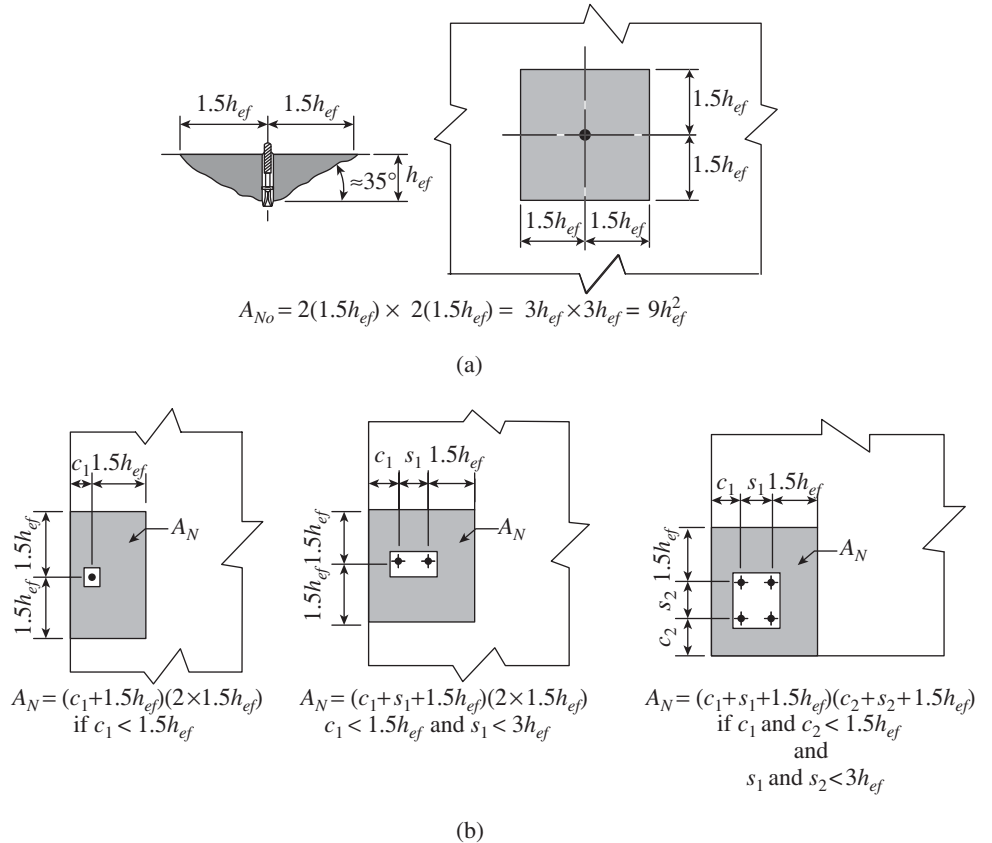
Projected areas for single and group of anchors (a) Single anchor (b) Group of anchors (Reprinted with permission from ACI)
